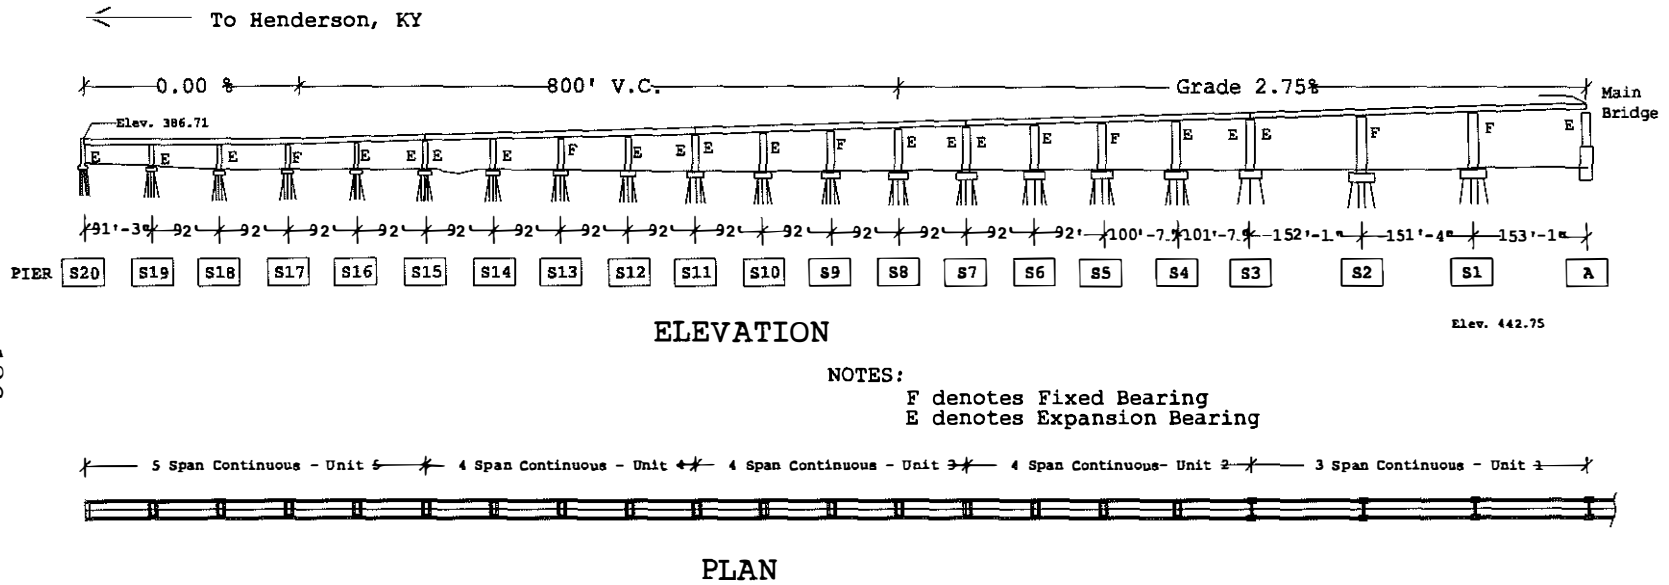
Plan and Elevation Views of Henderson, KY Approach of the US41 Southbound Bridge
